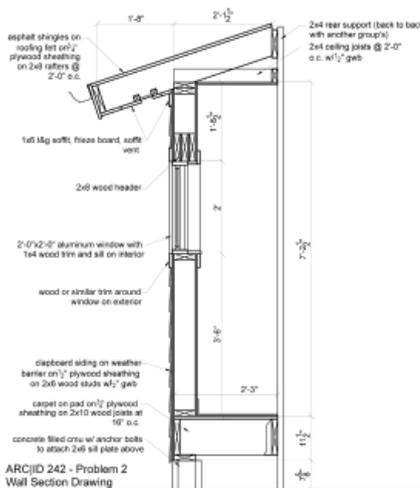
Building Technology I - Proposed Wall Section Drawing
